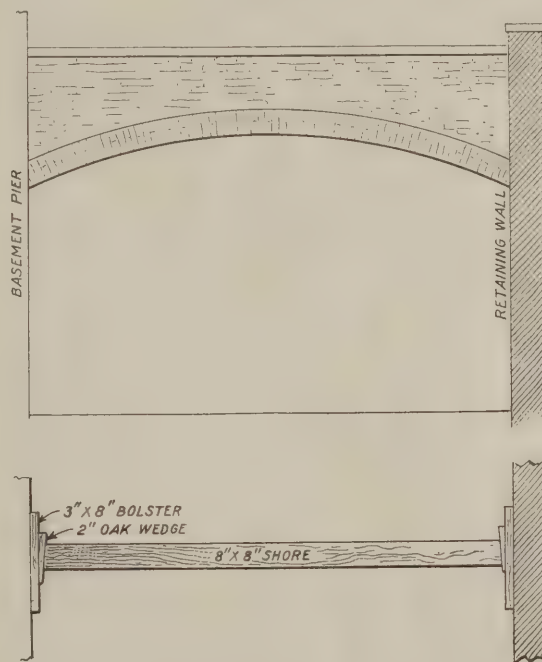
Method of Shoring and Buttrussing a Front Retaining Wall.
